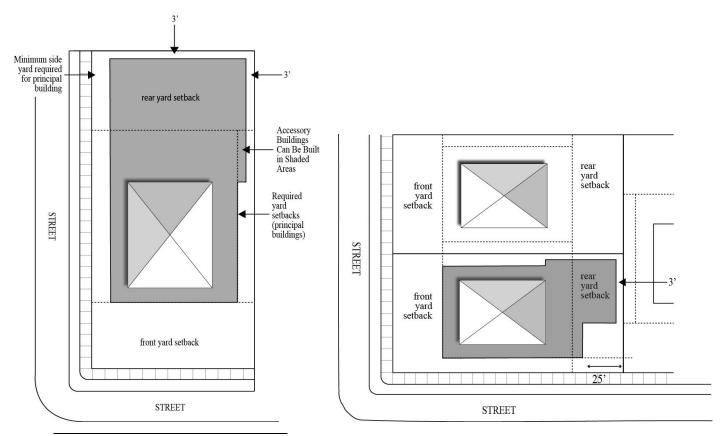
Accessory Building Placement for Corner Lots. Accessory buildings may be located in shaded areas.
